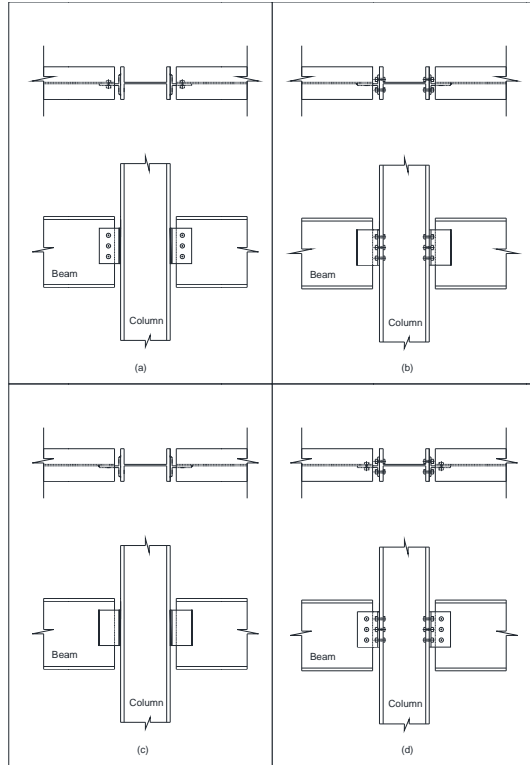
Types of WT shear connections: (a) welded-bolted (b) bolted-welded (c) welded-welded (d) bolted-bolted (Astaneh and Nader 1990)
